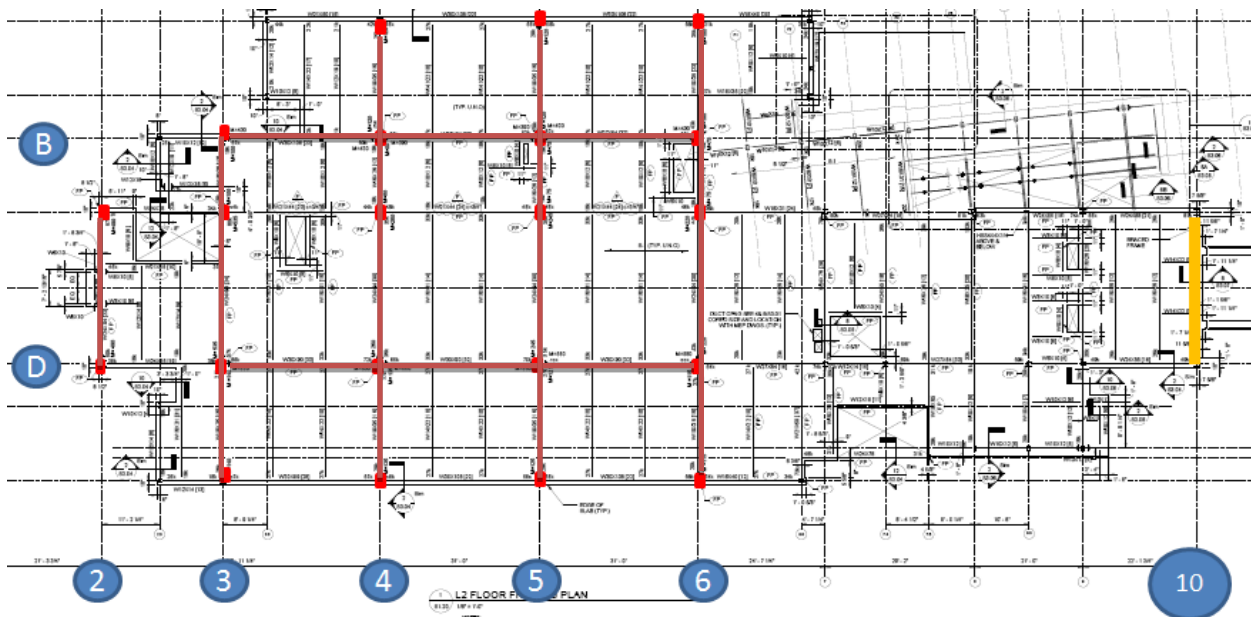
Location of Moment Connections (Red) and Braced Frame (Orange)
